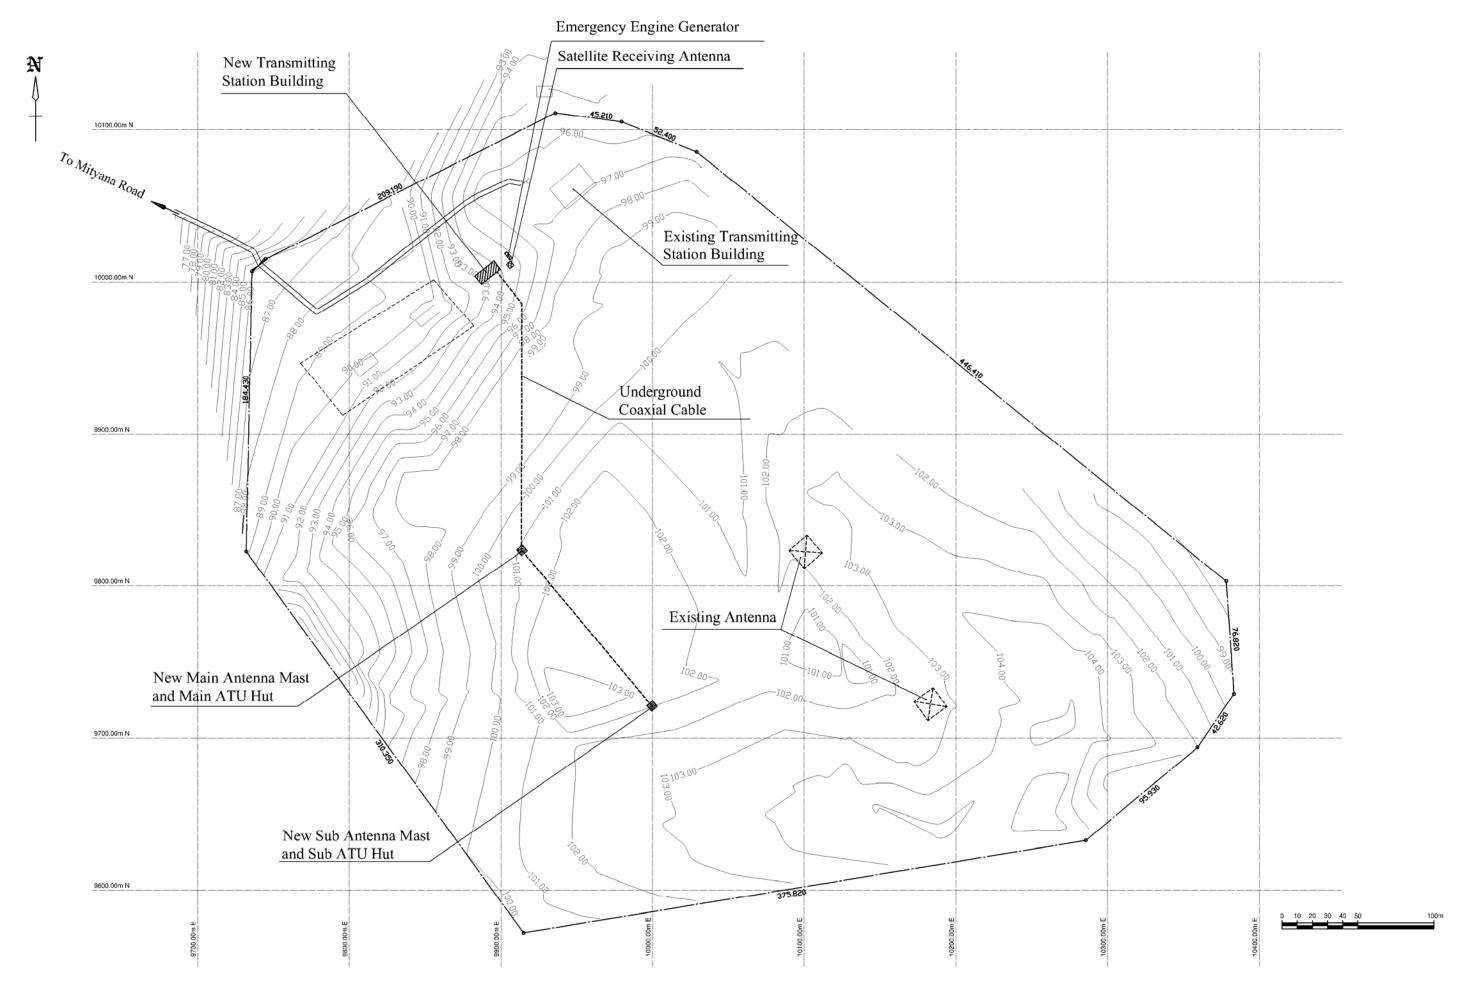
Mawagga MW Transmitting Station / Site Layout PlanS=1/2500
